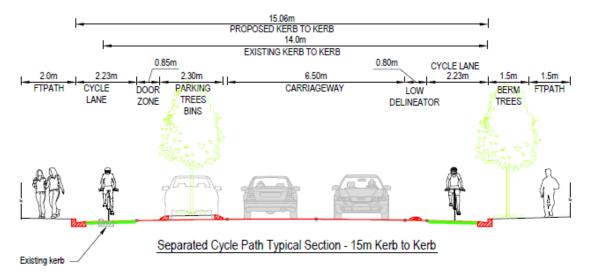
Parking option (the cross-section does not add up to 14m consideration needed for road marking widths etc)
